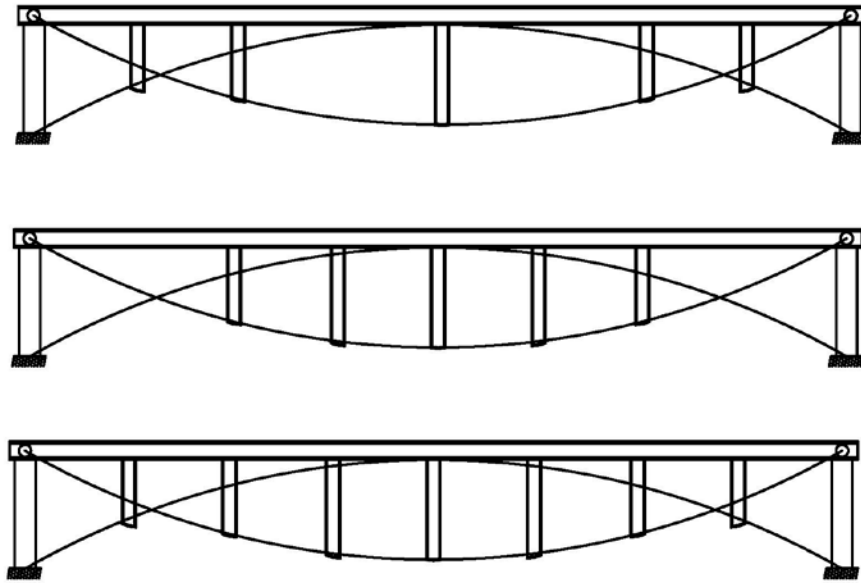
Proposed two-way beam string structures with respect to the three types of struts.
